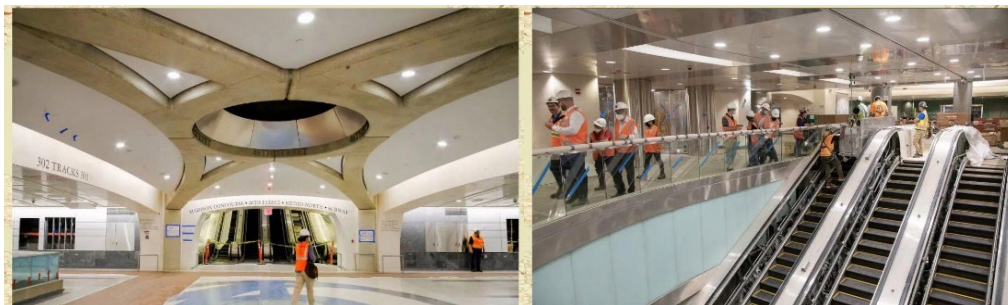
Renovation effect drawing and construction site of Grand Central Station in New York
